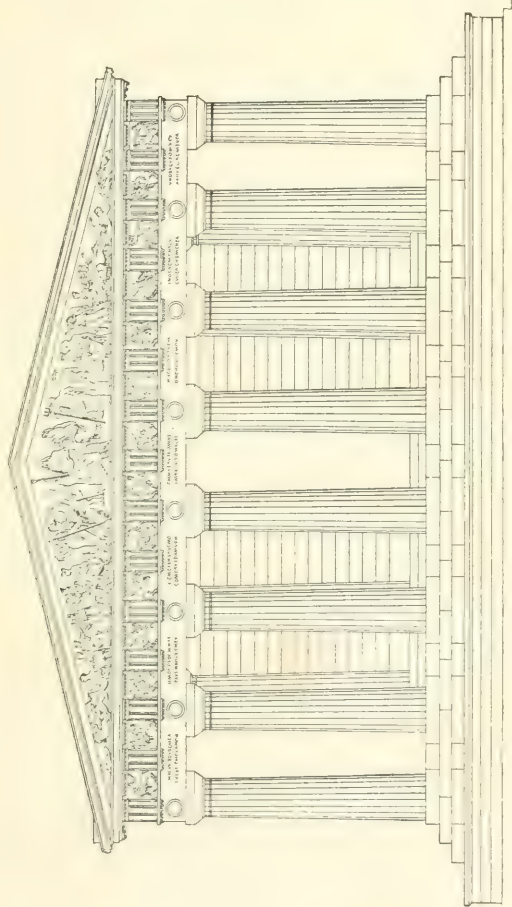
PLATE XVII.—Front elevation of the Parthenon, restored by Stuart and Revett.
